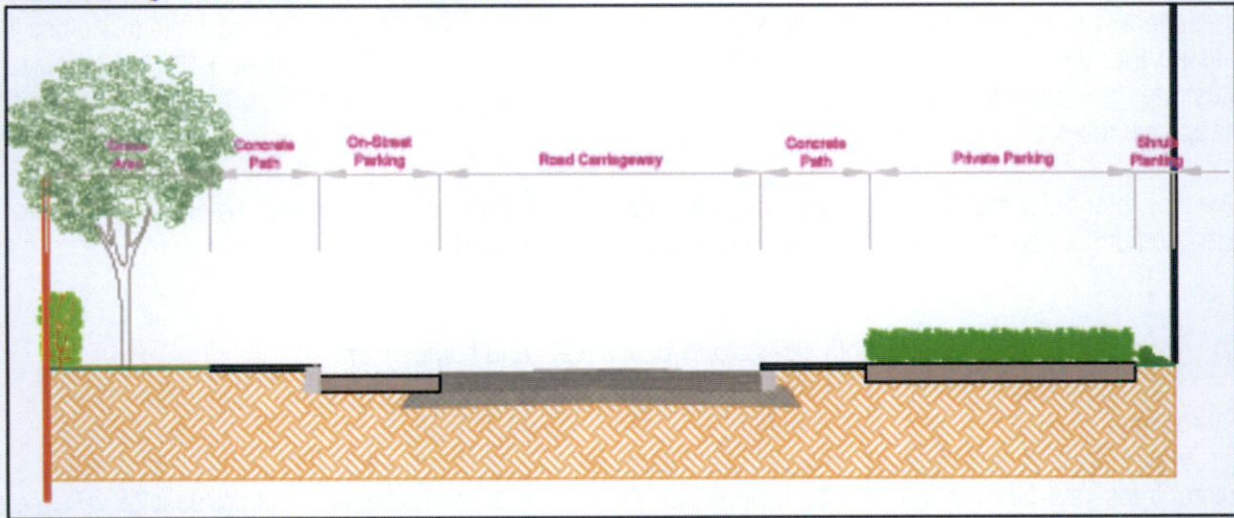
Copy of section P – illustrating the proposed landscaping detail E-W across the westernmost local street south of Clonburris Link Street
